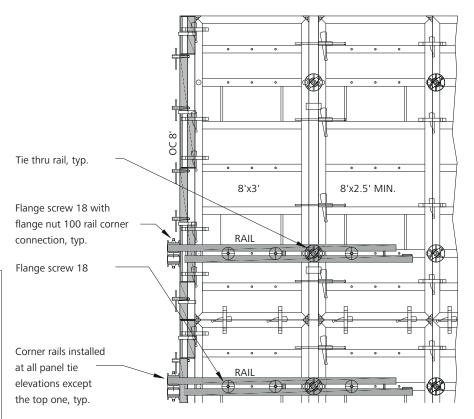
Walls > 21" but \leq 27" thick - example corner elevation
